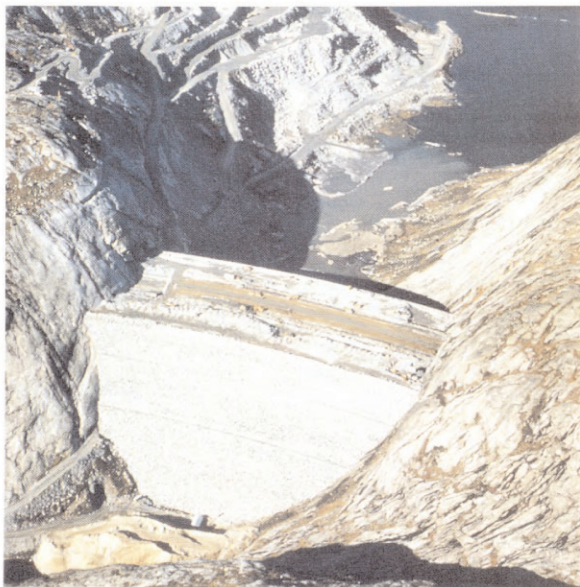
The Svartevatn Dam (129 m high) with moraine core under construction
